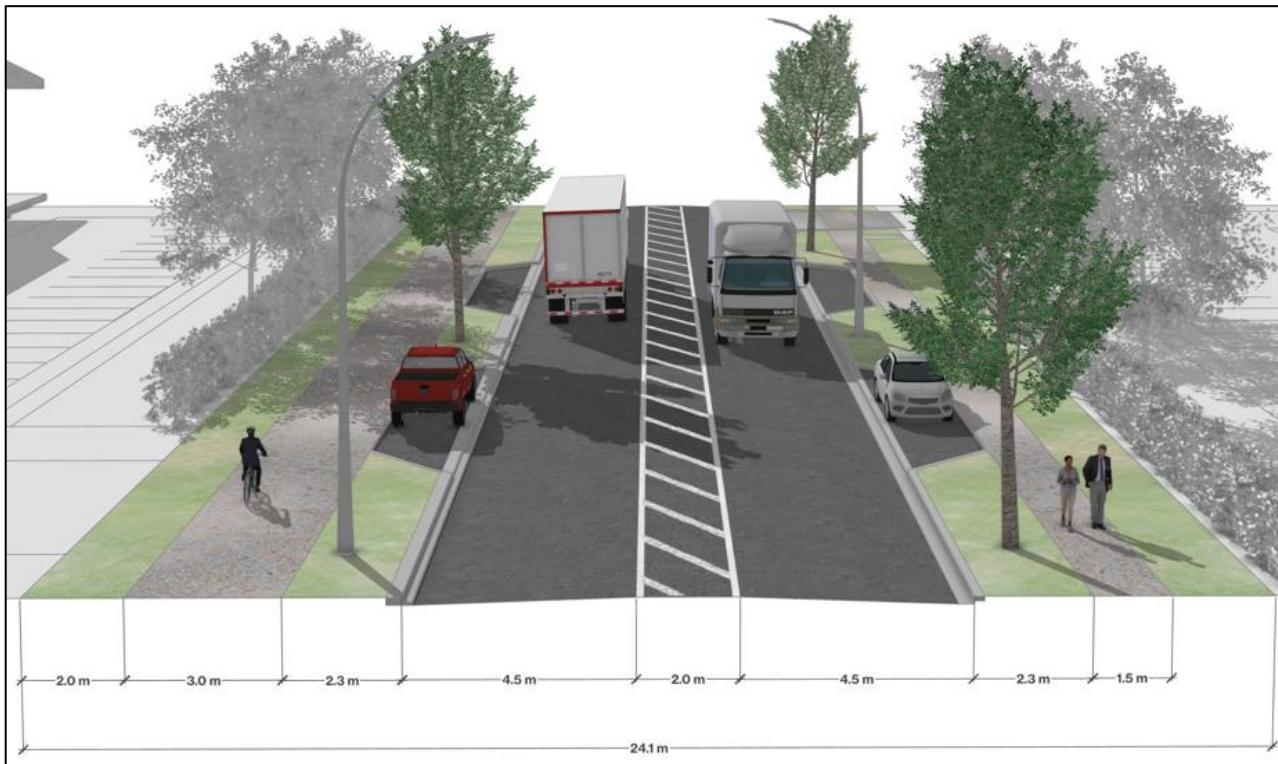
c) Indicative Typical Cross-section of the Te Rapa Structure Plan Collector Roads (Central Spine)
